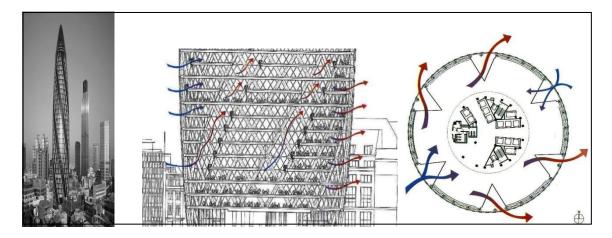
15: Swiss Re tower, segmented atria section and air flow plan (Salib & Wood, 2013)
